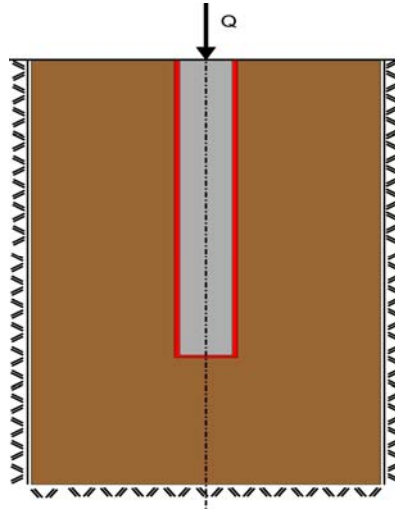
Geometric model for jet-grouting pile–soil system;
